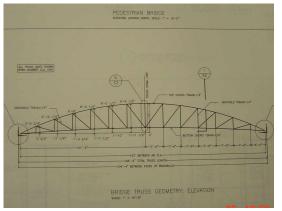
UC, Irvine pedestrian bridge steel truss bridge design layout provided by construction company
